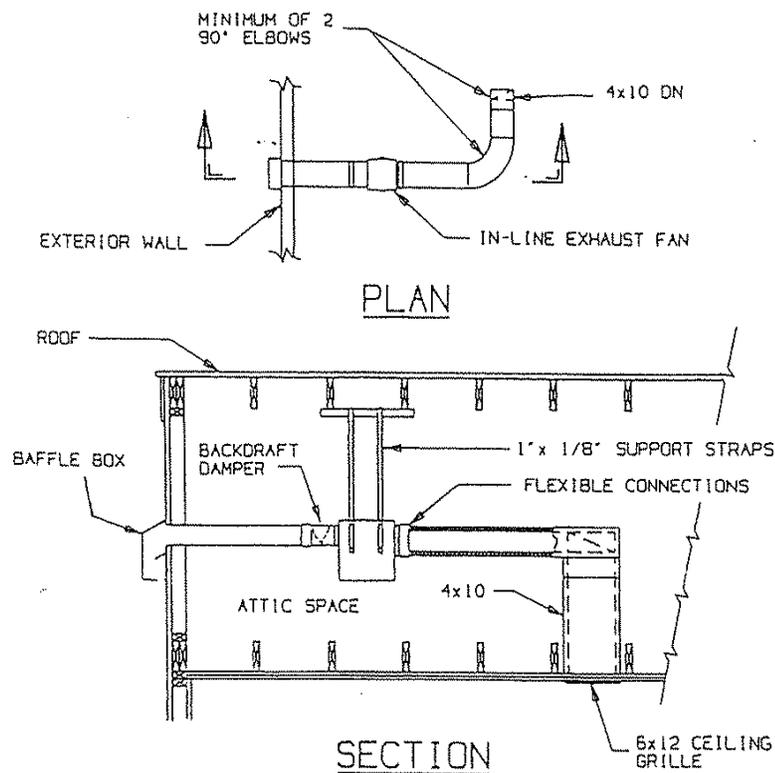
Controlling Noise Entering Through Ducts in Attic Space
